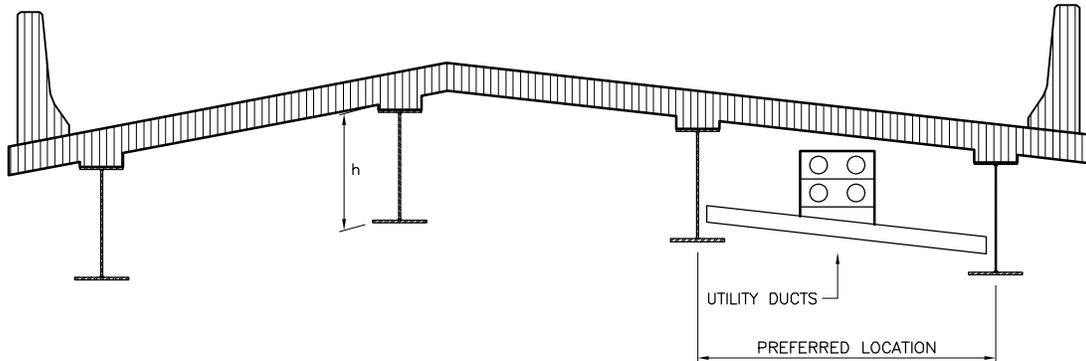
Slab on Concrete/Steel I Type Girders
